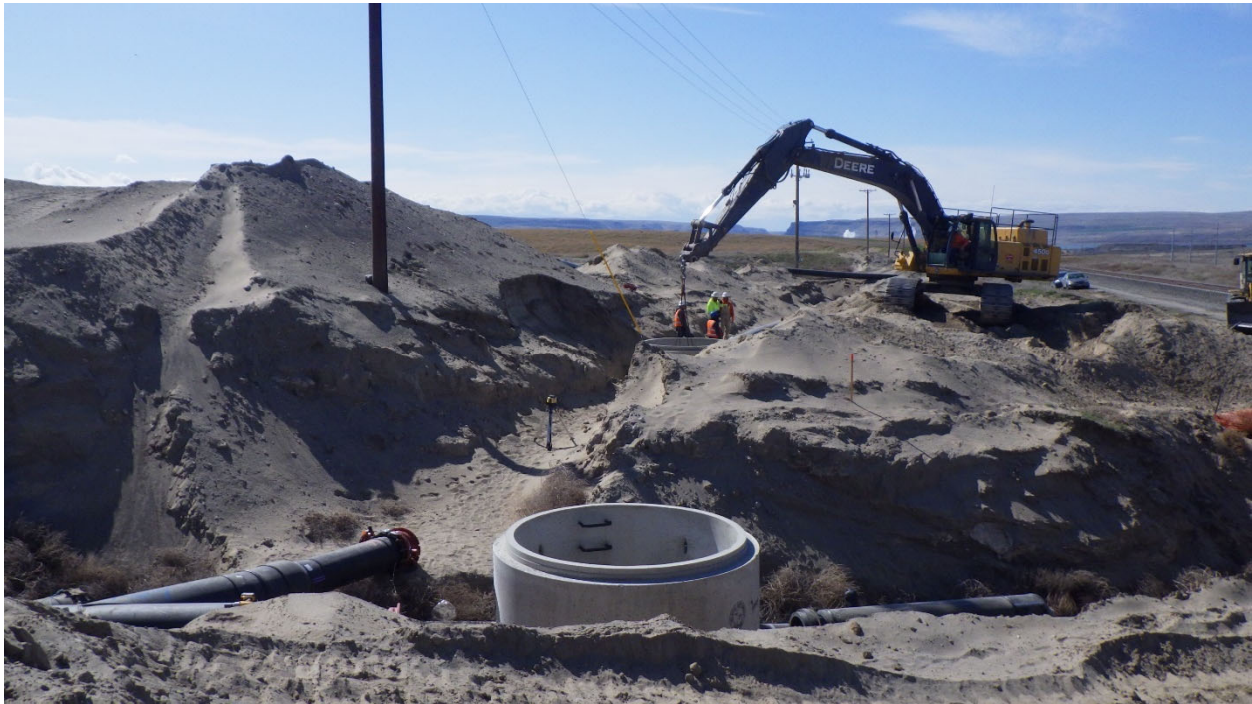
Installation of two manholes at the A-Line and B-Line connection point, view to the south.
